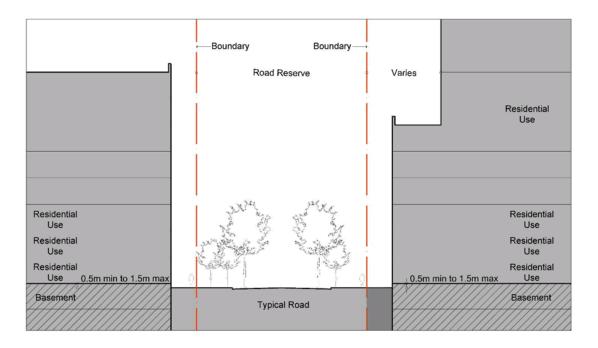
Street Wall Height at Typical East West Street, NTS
